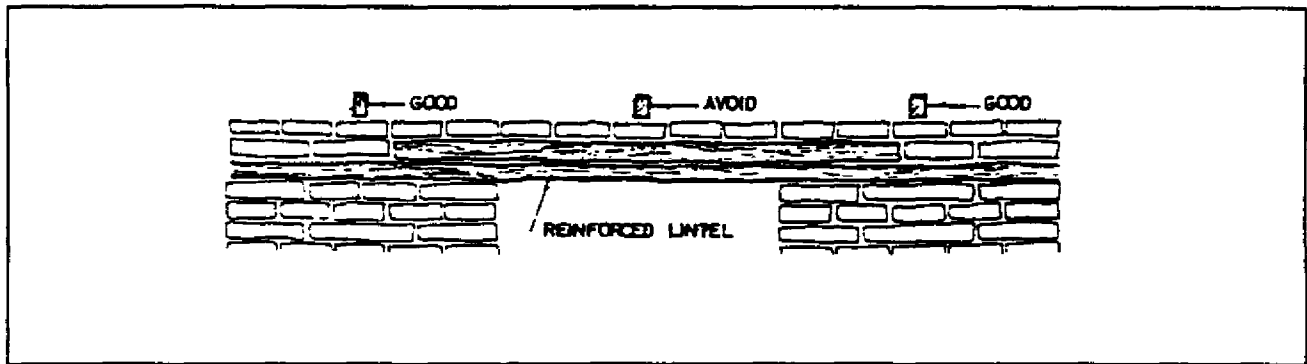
Reinforcing Lintel under Floor Beam [1].
